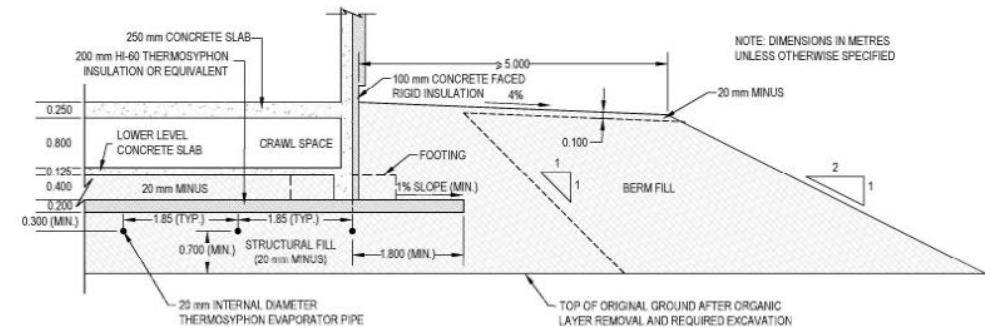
Recommended design section for a thermosyphon-stabilized building foundation
